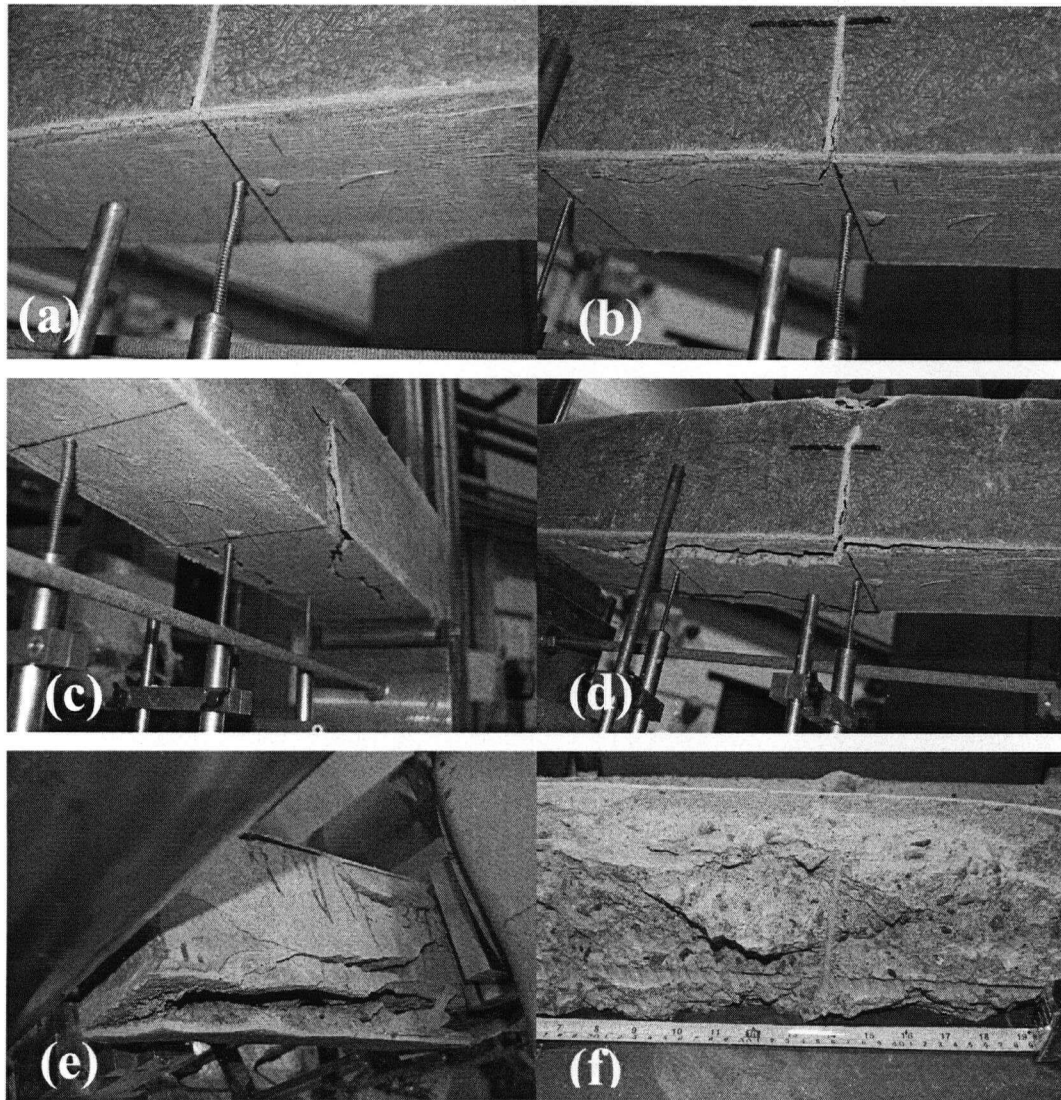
Beam B2-S-1: (a) to (e) Crack Development under 3-Point Loading;
